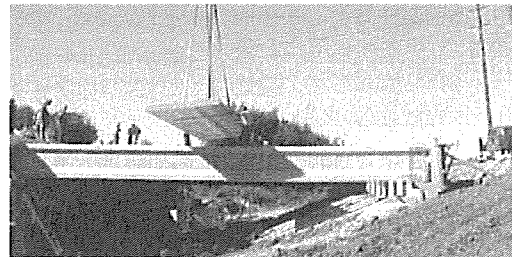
Installation of FRP deck panels on PC girders (photo: Martin Marietta Composites)
